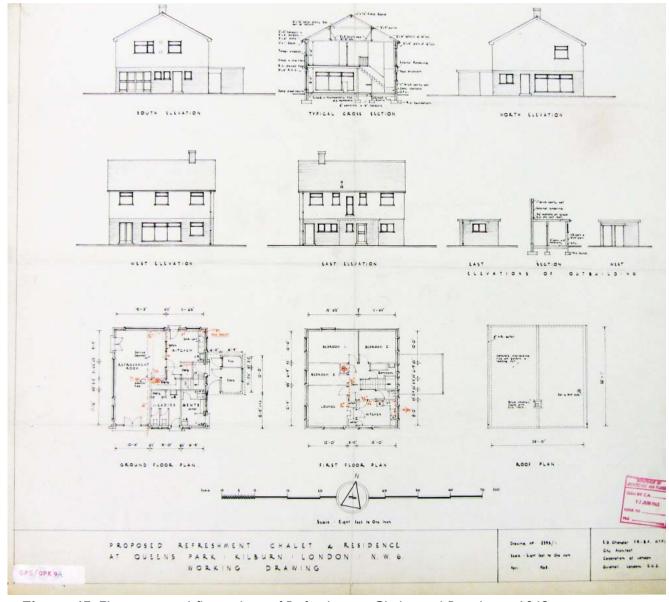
Elevations and floor plans of Refreshment Chalet and Residence 1963
